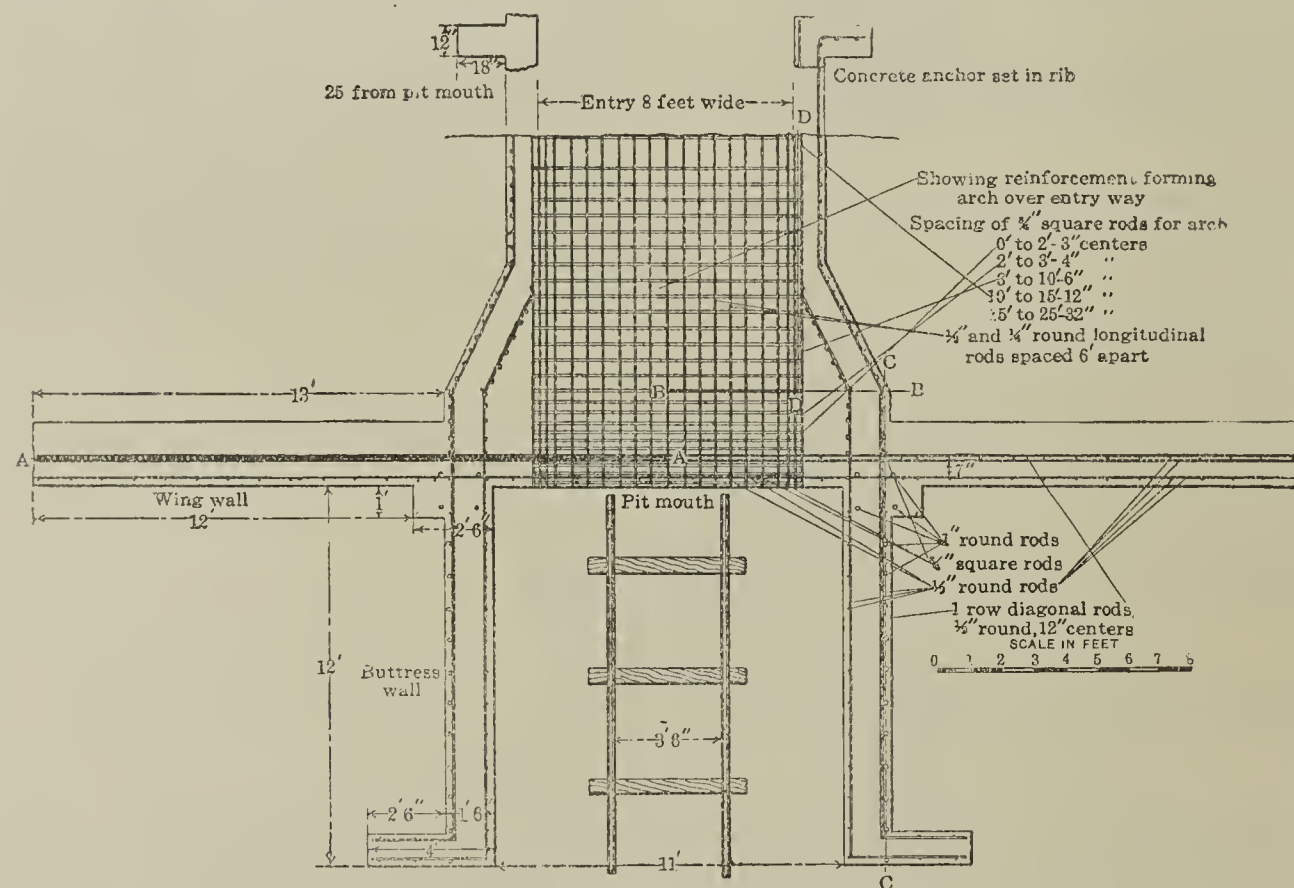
PLAN OF REINFORCED CONCRETE PORTAL.
